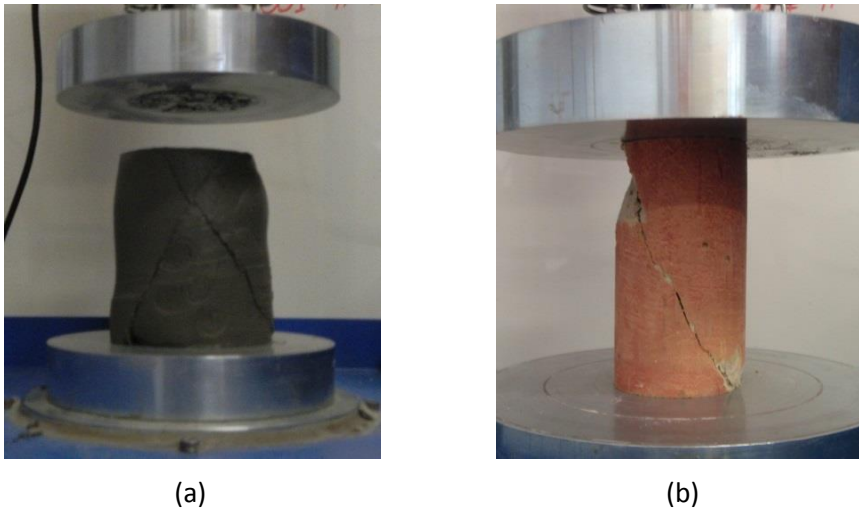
Modes of failure in compression test specimens; (a) plastic failure ('barrelling'); (b) brittle failure (shear plane)
